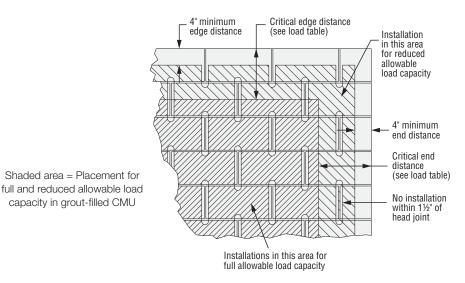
Allowable Anchor Locations for Full and Reduced Load Capacity When Installation Is in the Face of Fully Grouted CMU Masonry Wall Construction
